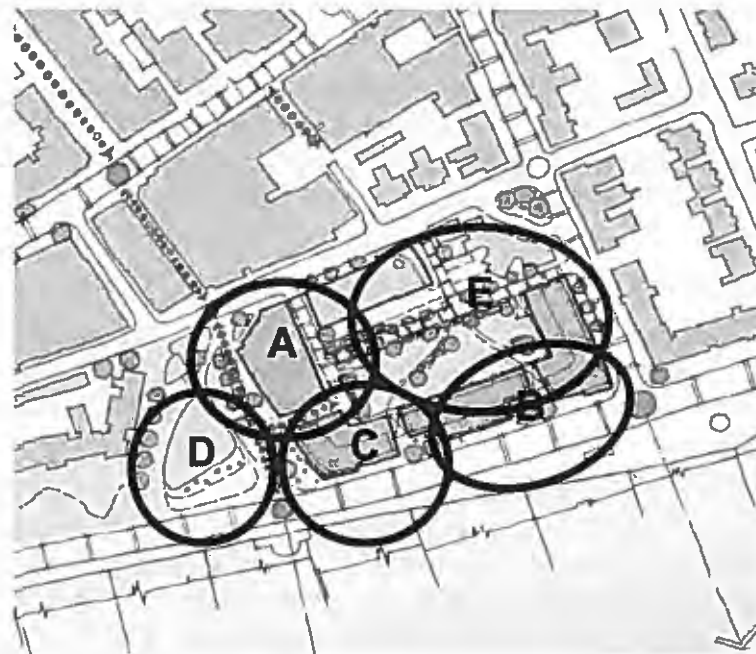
Plan of Regis Centre site taken from 2003 Masterplan
